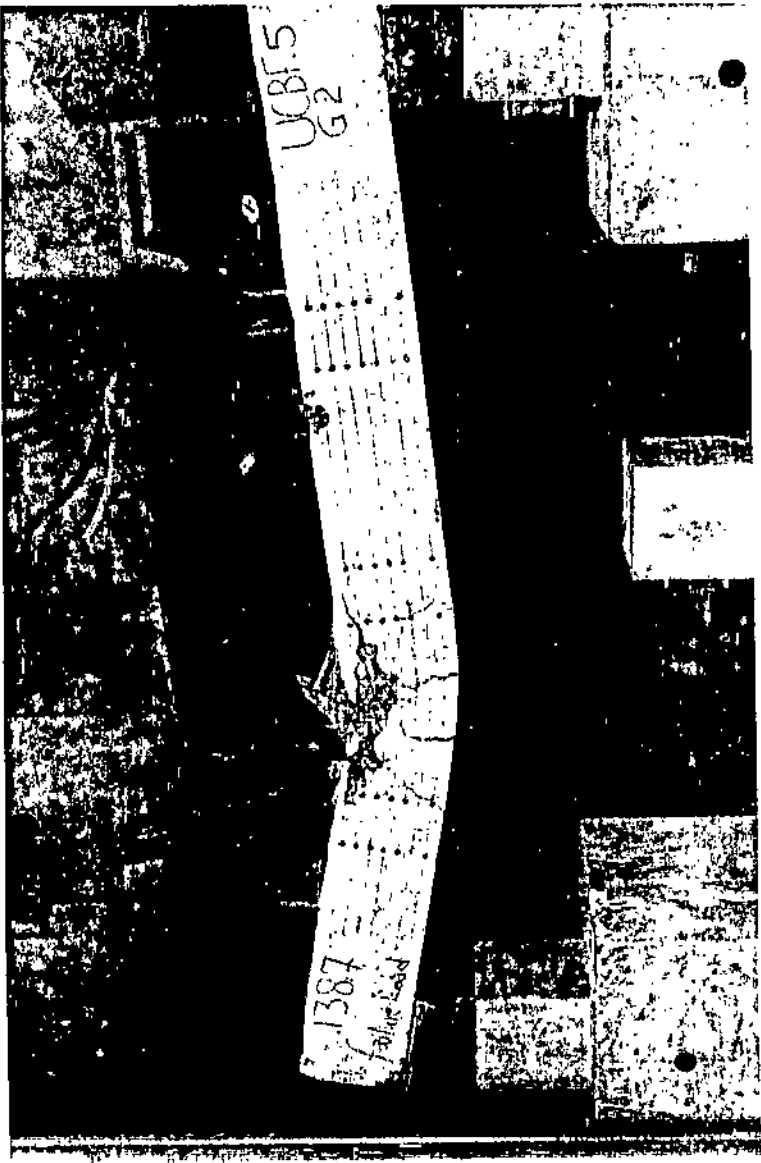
TYPICAL CRACK PATTERNS FOR BEAM # 9
